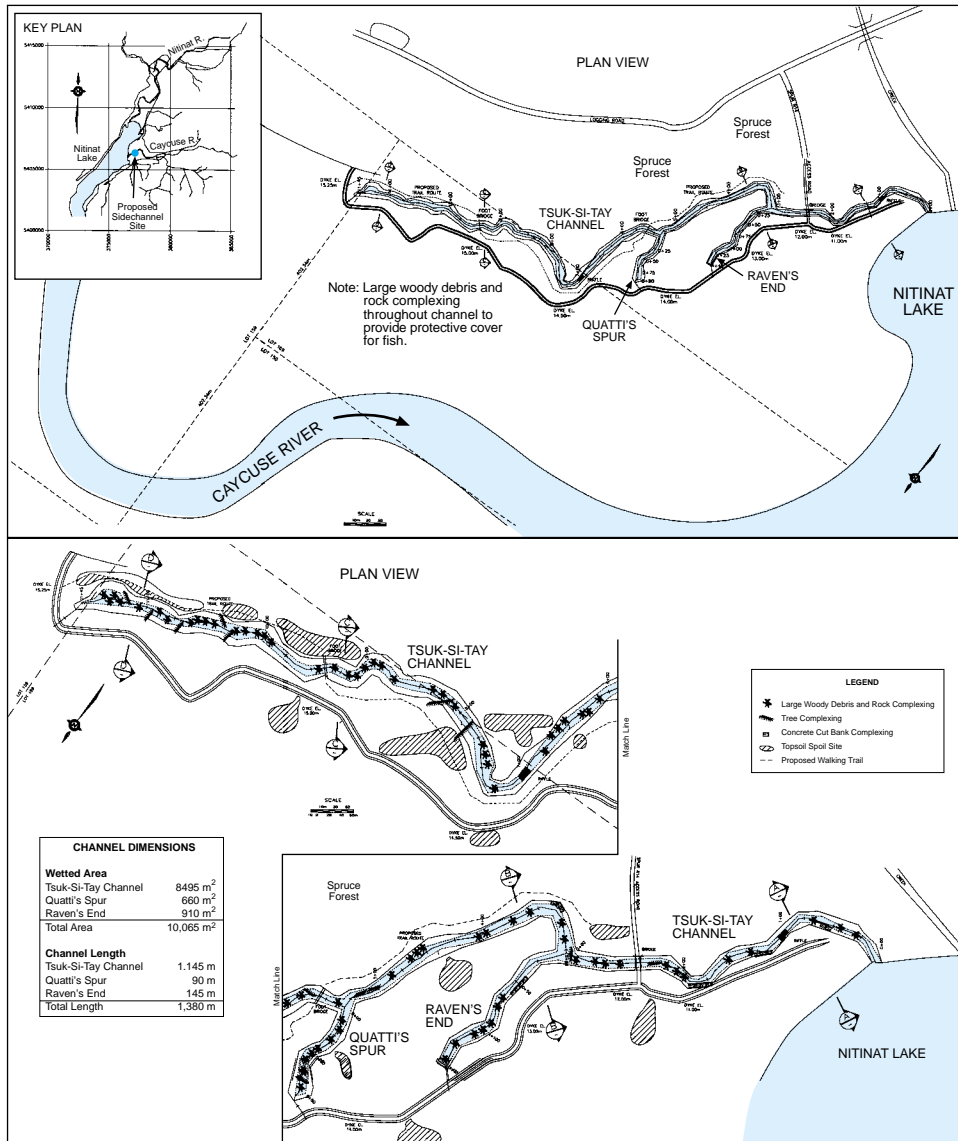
Caycuse River Tsuk-si-tay groundwater channel, plan view and detailed view - as built.
